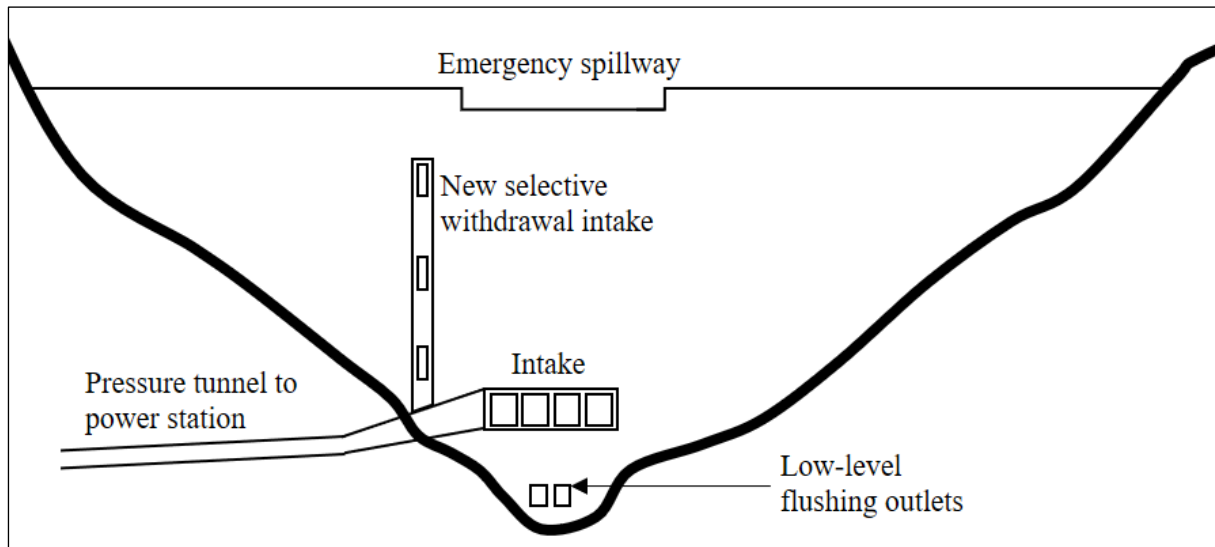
Low-level outlet and intake layout of Gebidem Dam (adapted from Morris & Fan, 1998)
